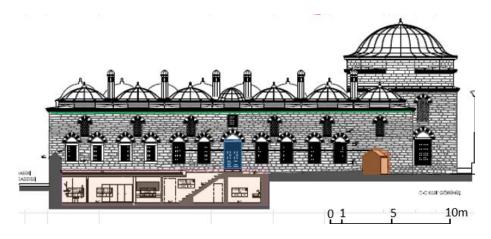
Section C-C showing the staffroom underground of the backyard and the additional garden wall, 2012 (archive of DGF)
